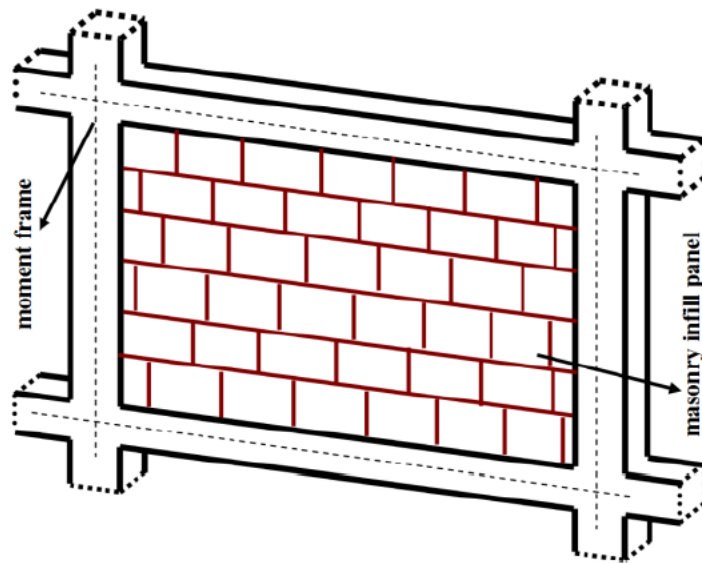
Masonry infill walls (Dilmac et al., 2018)
